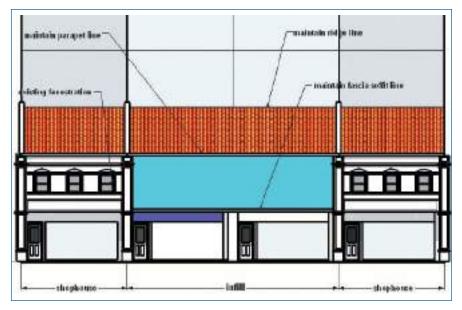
Alternative Arrangements For Ground Floor Shophouse Units
